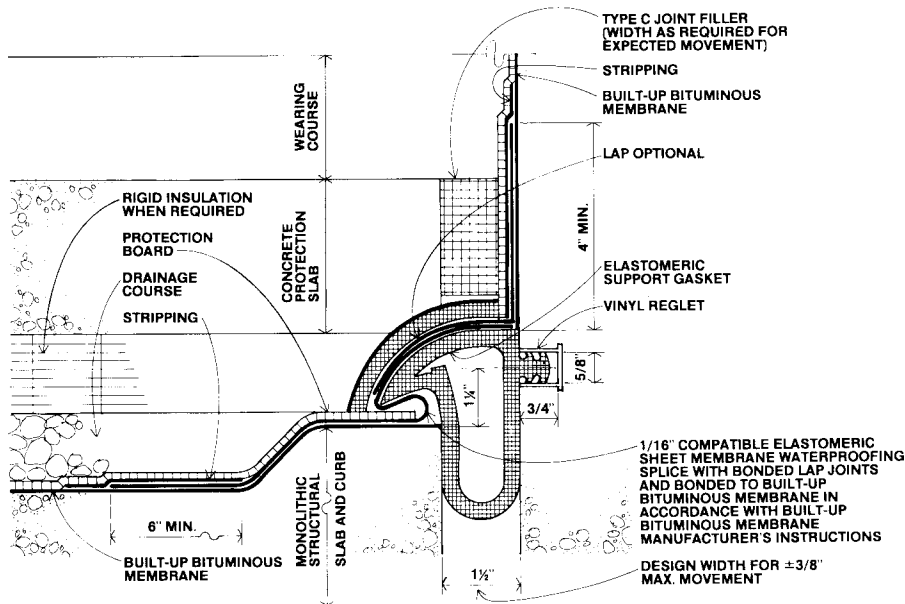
Water Shed Concept Expansion Joint (see also 9.8.7.2 and Fig. 7 for Easier Gasket Installation Detail)
